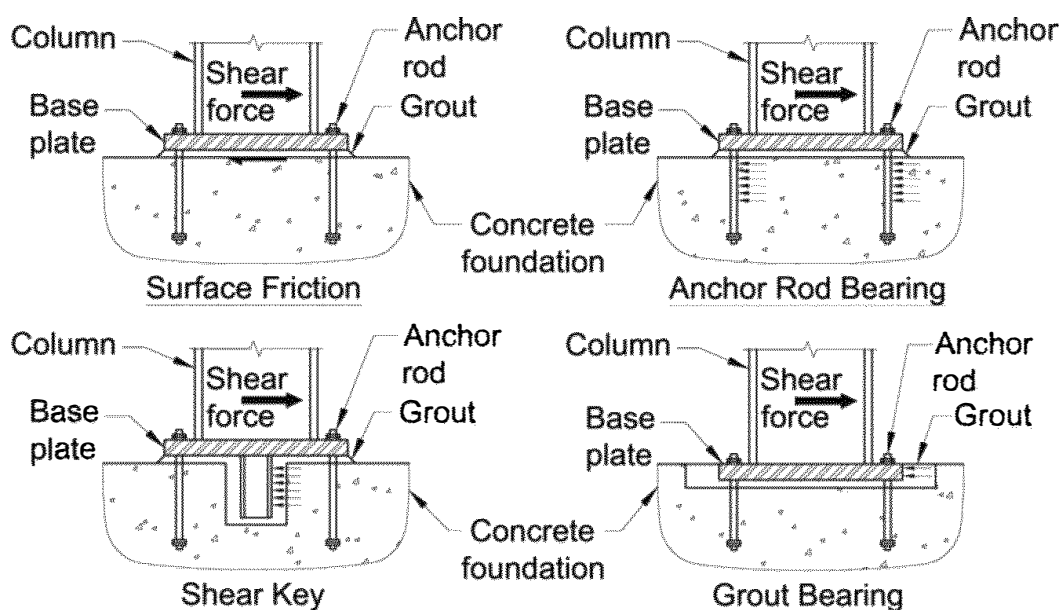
Shear transfer mechanisms—column supported by foundation.
